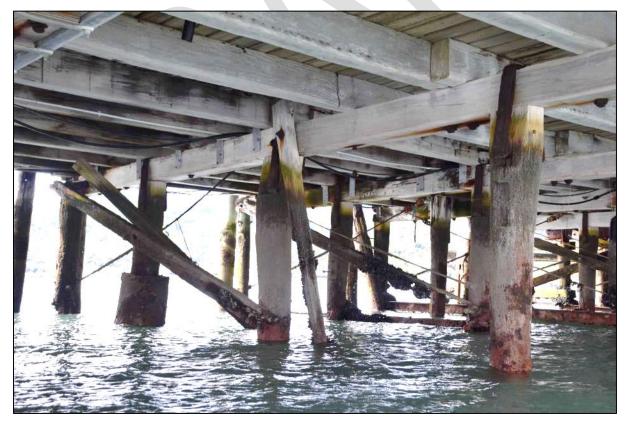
An image 2 bays closer to the shoreline than 16 showing the original widened structure under the original shed –with continuous pile cap spanning over the additional piles and wrought iron straps to the heads of the piles now delaminating and, in places, no longer connected to the piles. The bent in the foreground is missing bracing and one of the piles has a 'jacket' repair.
